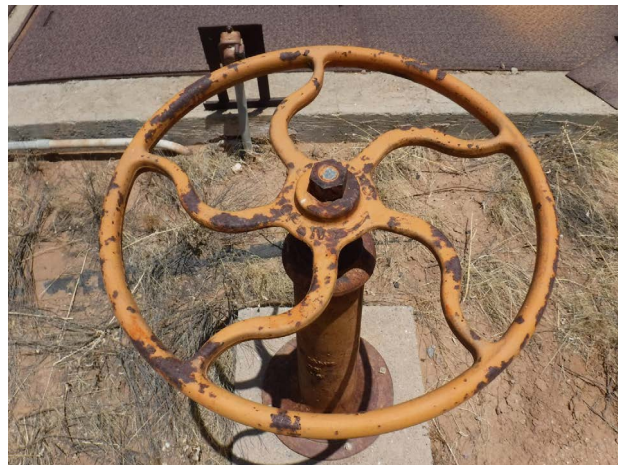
Property 24065, detail of wheel valve outside west elevation, plan view.
